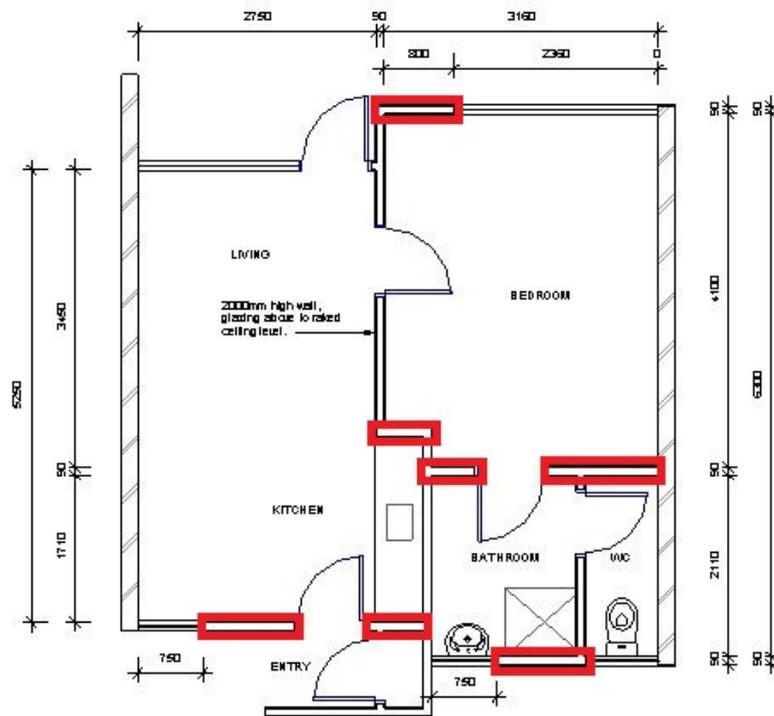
Walls used for bracing in the longitudinal direction, double unit.
